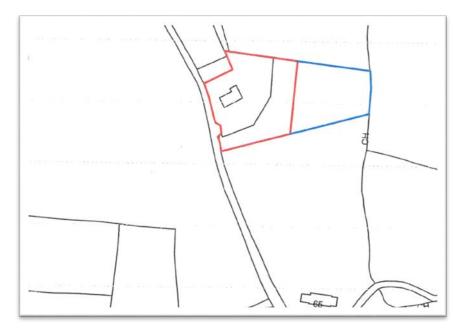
Approved plans to extend curtilage and for domestic garage under LA09/2020/1426/F
